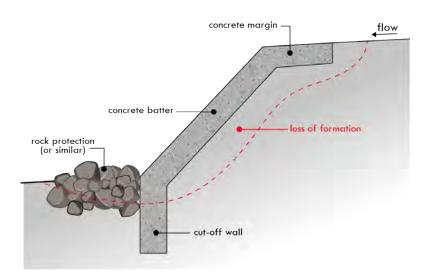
BT8 Addition of Concrete Margins and / or Concrete Barrier with Cut-off Walls
